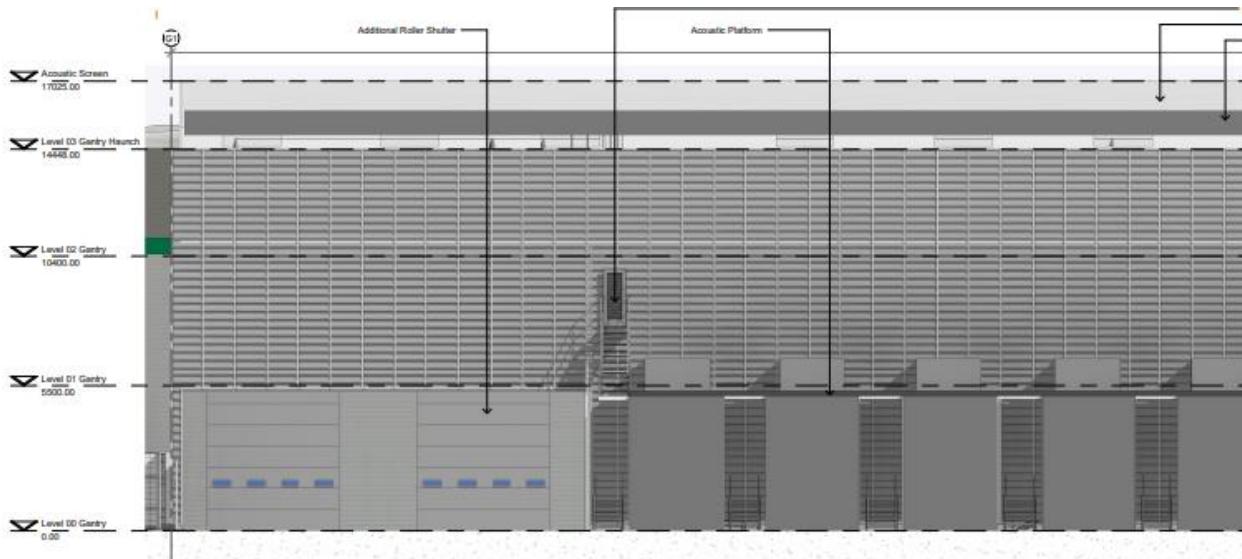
Excerpt of Proposed Western Gantry Elevation Drawing – the additional loading door proposed appears entirely congruent and in keeping with the wider composition, structure and materiality of the consented western façade profile. The additional roller door integrates successfully within the façade design.
